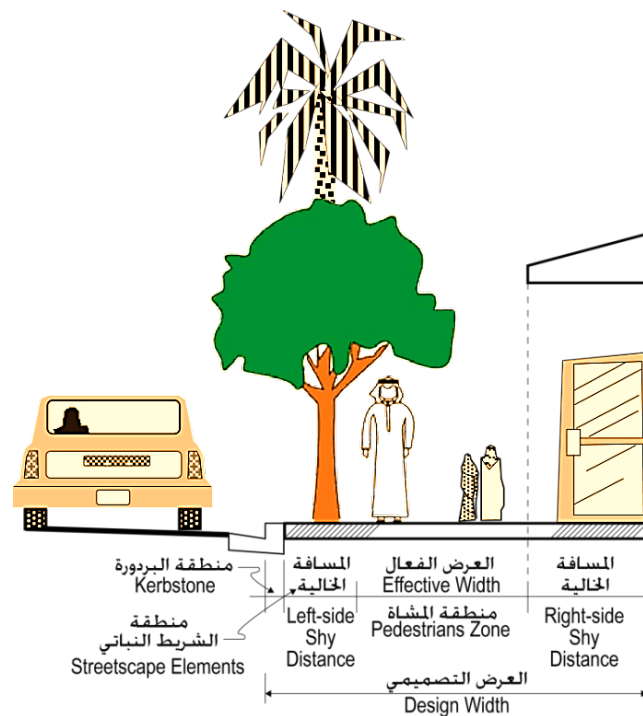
Spatial distribution or zoning of the pavement space in Saudi Arabia (Source: MOMRA, 2006: 3)
